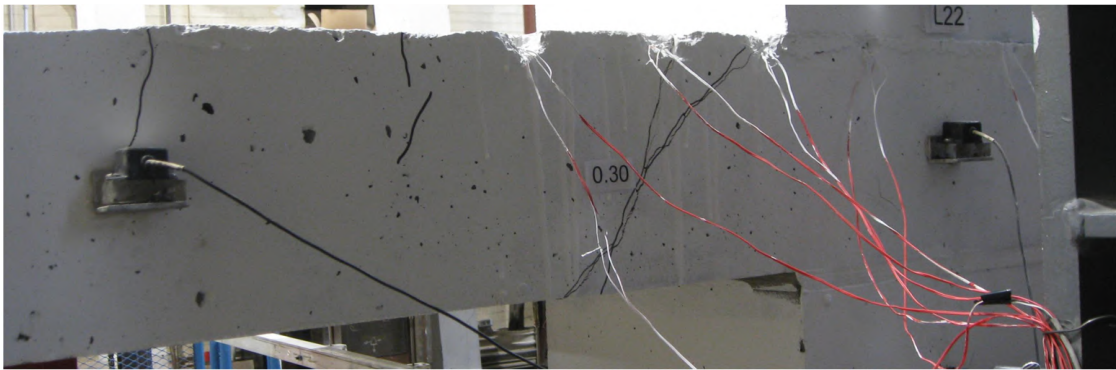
Specimen 3 free edge face cracks at $V = 234.9$ kN (east side)
